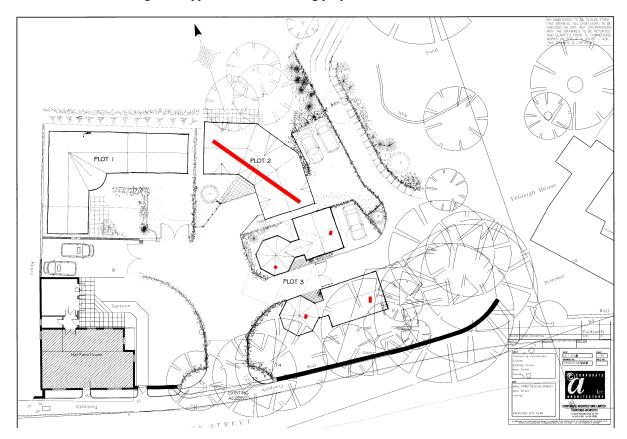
Application area showing proposed development and proposed trench and test pit locations
